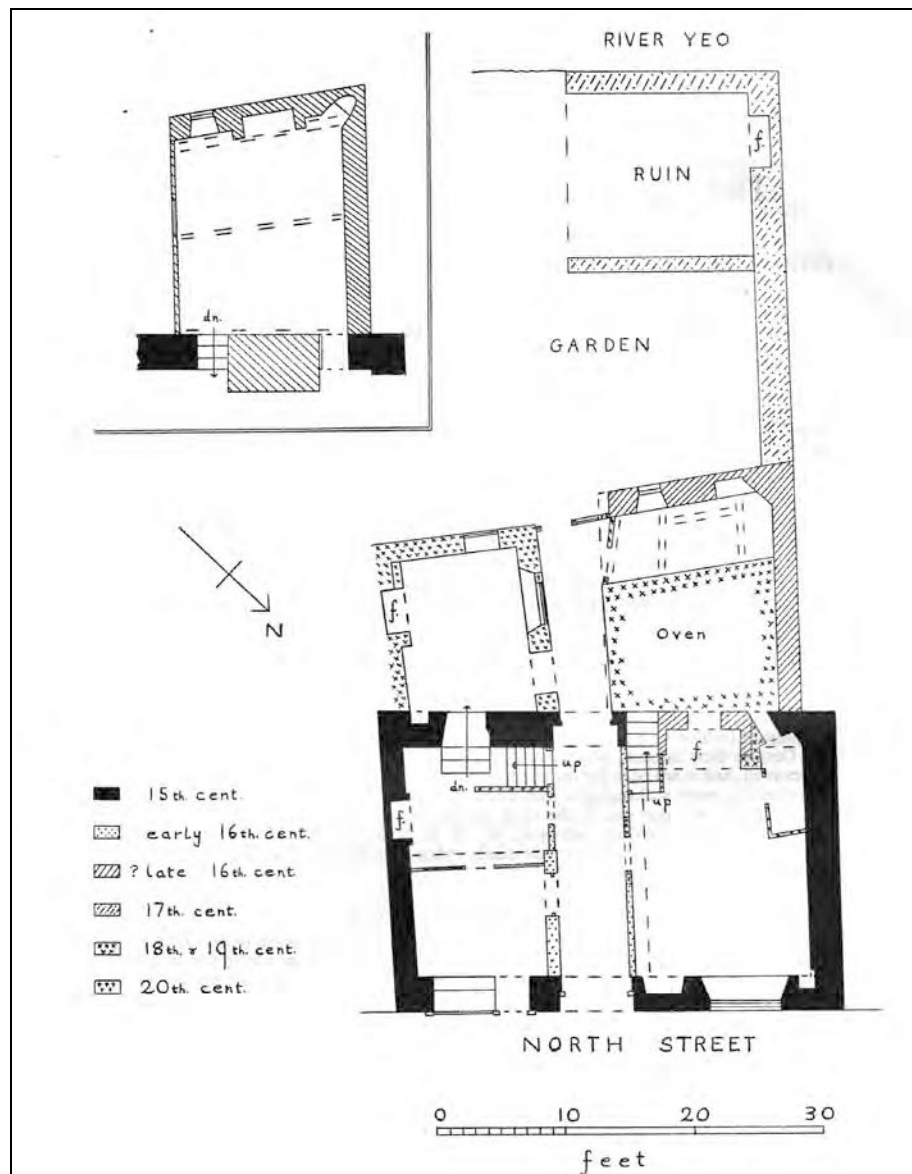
No. 33 North Street Ashburton ground floor plan. From Laithwaite 1971.
